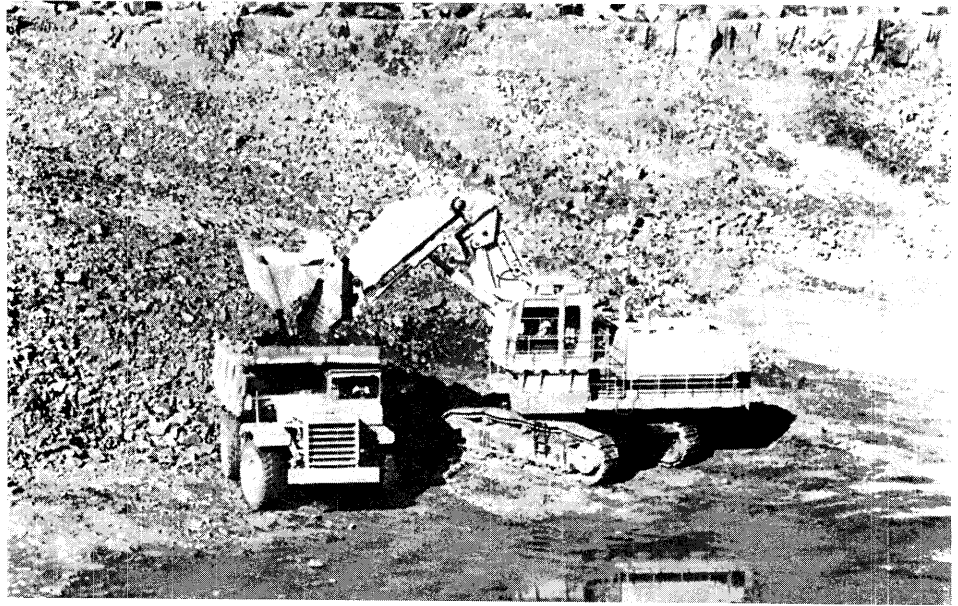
Hydraulic shovel. (Courtesy of Kobelco Construction Machinery America LLC)
